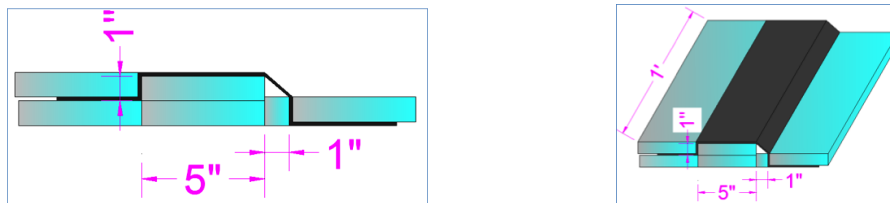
Setup for Waterproofing Membrane Test Under Wheel Loads
